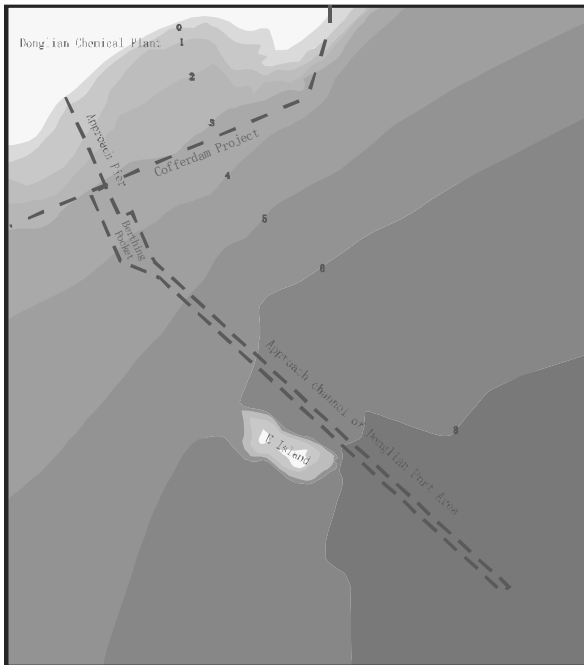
Plan layout of Nanhai Petrochemicals Donglian port area (layout)
